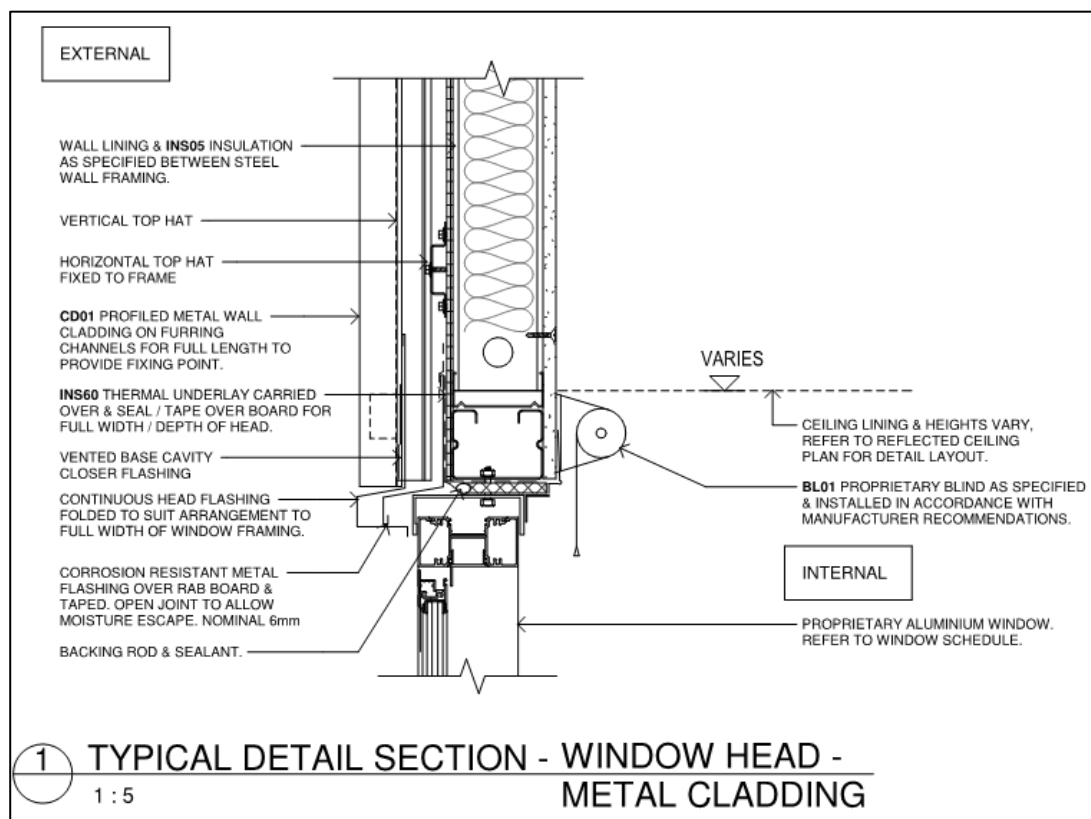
Typical window head details : Source – Plan M-AR-DW-5104 Typical Details – Sheet 4
